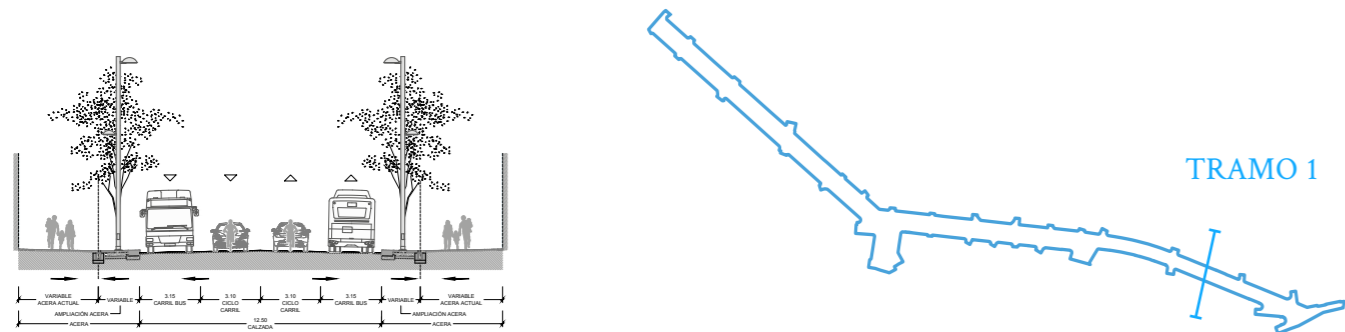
Standard plan and cross-section of the remodelling project; Section I: Red de San Luis to Calle de Alcalá - Source: Ayuntamiento de Madrid
